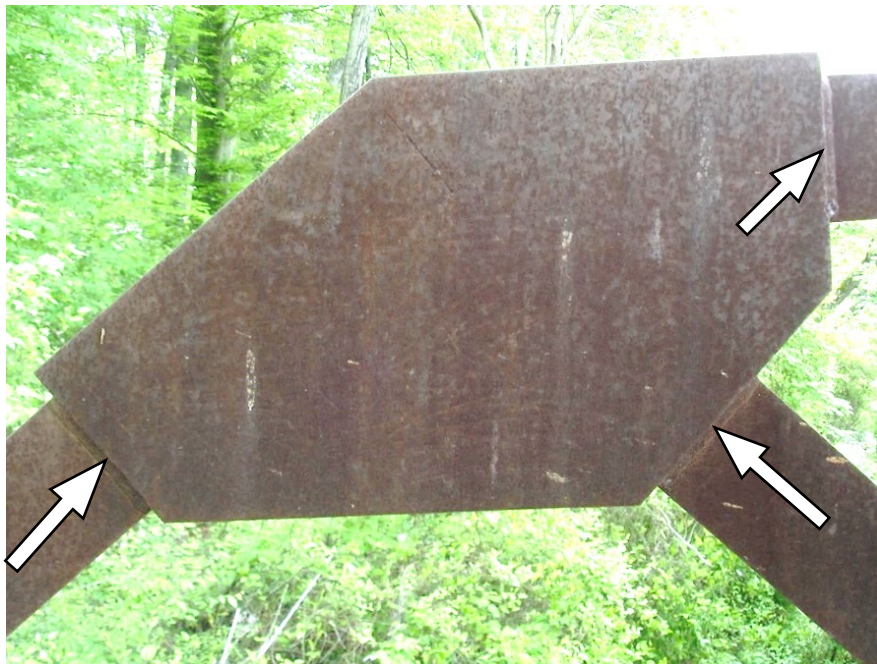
Steel Gusset Plate with Welded Connections on a Pony Truss
